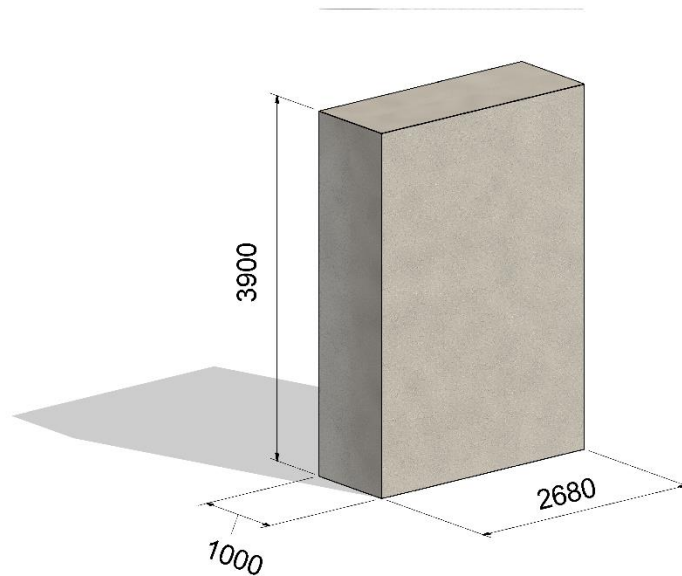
A diagrammatic representation of a typical F01 wall unit, showing its dimensions (in mm). Note that protruding reinforcement for the purposes of connecting the wall units to the cast-in-situ base and capping is not shown.
